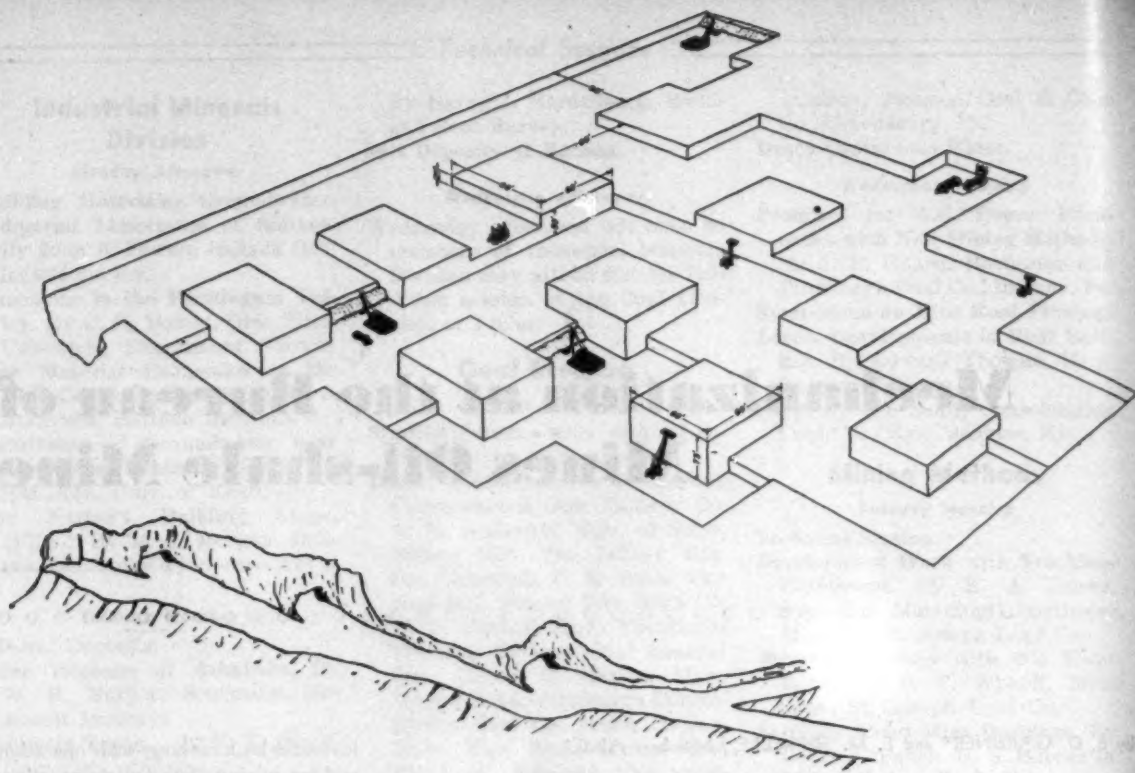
Underground quarry mine layout, oil-shale demonstration plant, Rifle, Colo.
